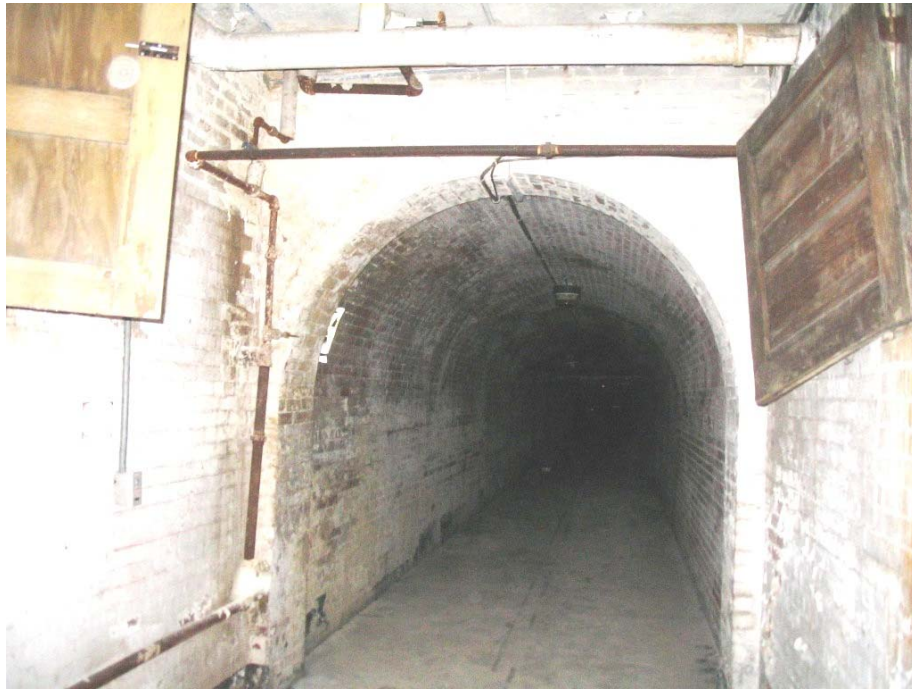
Looking south toward Building 74; Note corrosion on pipes
